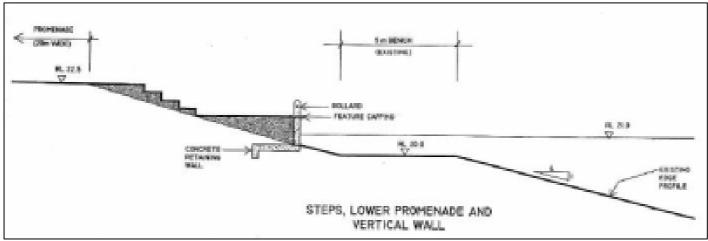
Typical Formal Edge Treatment – Steps, Lower Promenade and Vertical Wall
